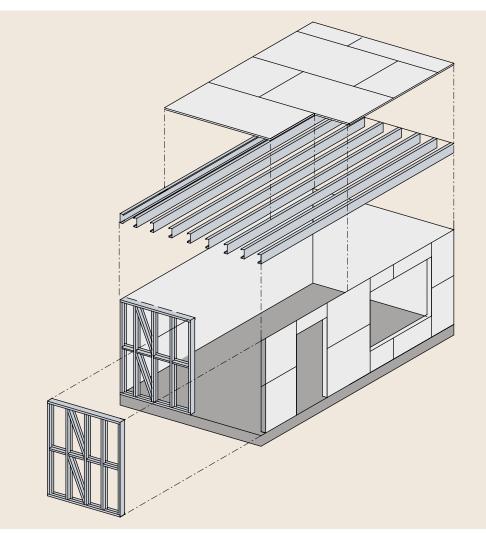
Site assembly of light steel wall panels The main advantages of panel construction are:
